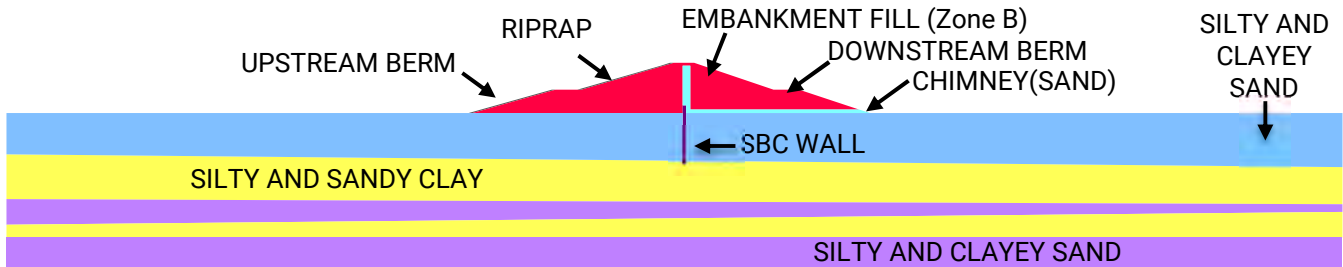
Alternative 3 Embankment Geometry and Zonation— Walnut
